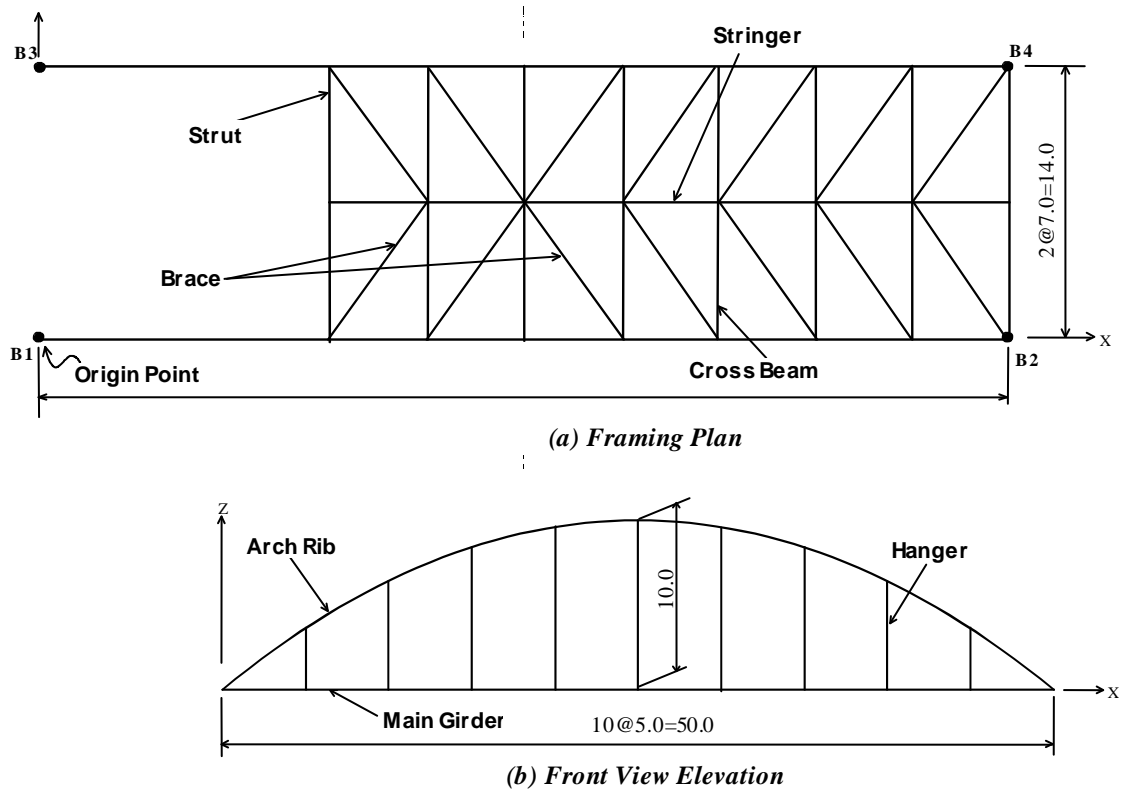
Framing Plan and Front View Elevation of the Arch Bridge [Unit: m]
